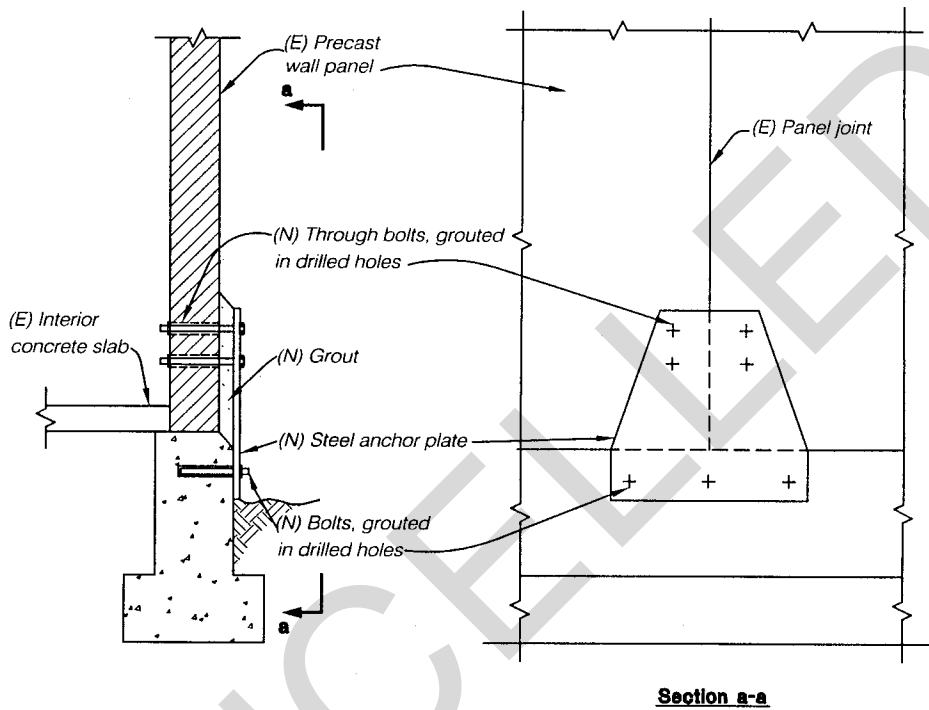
Steel Plate Anchorage for Precast Concrete Wall Panels
